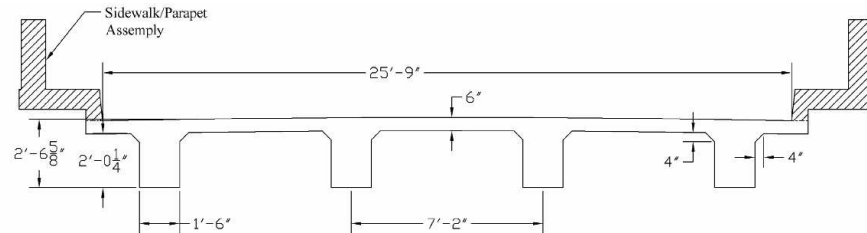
Cross Section of Bridge Deck and Girders (Ref. GDOT Drawing)
